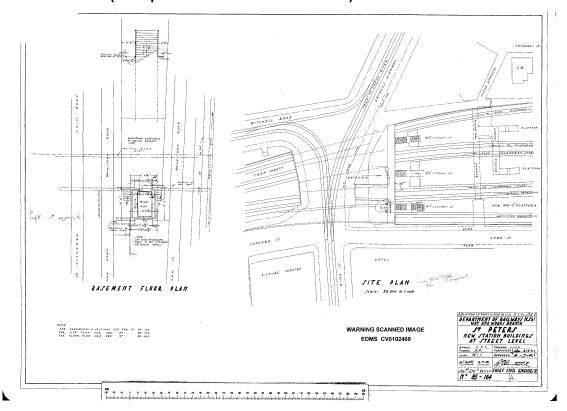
Proposed St Peters New Station Buildings at Street Level, 6 July 1949, which were never built (Transport for NSW EDMS CV0102469)
